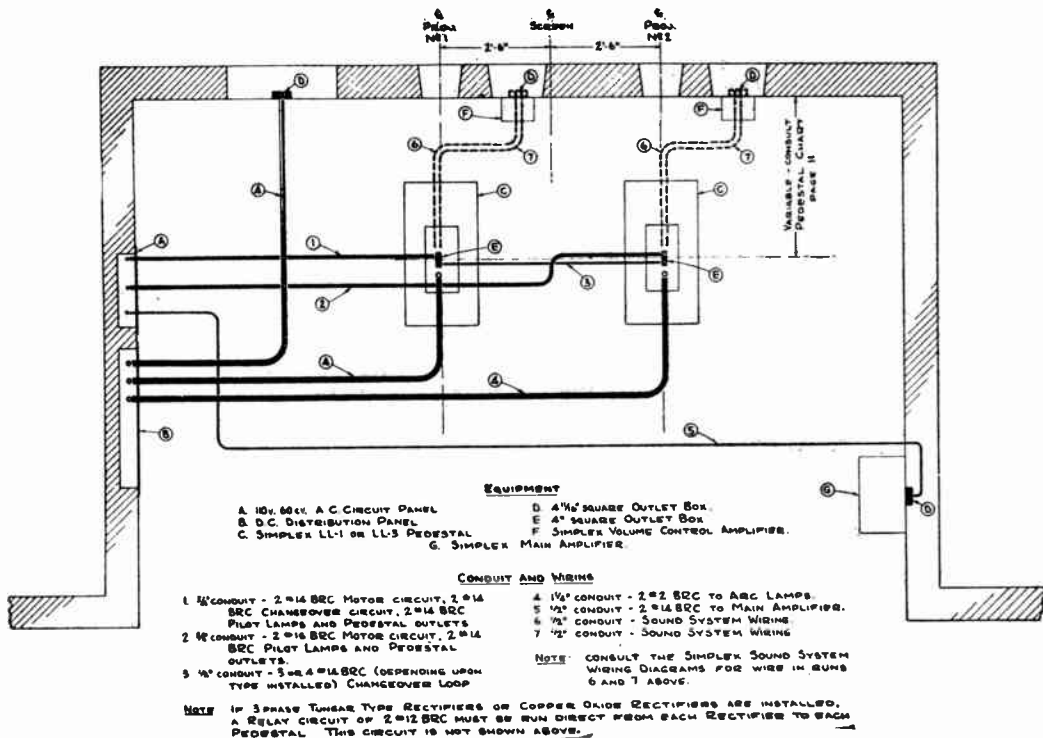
Showing floor plan conduit layout and wiring. NOTE.—The electrical wiring, construction and fire control devices shall be in accordance with the latest requirements of the *National Electrical Code* in addition to *Local Ordinances and Regulations*.
